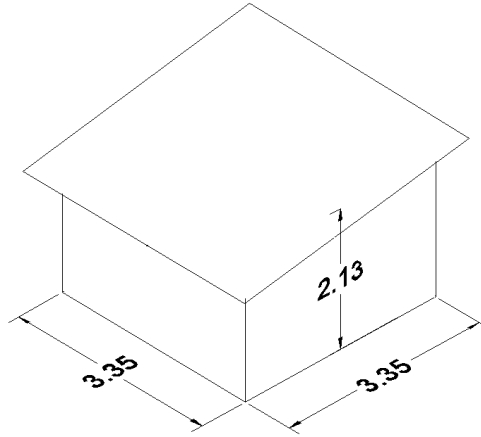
Dimensions of the full-scale building model (dimensions in m)
